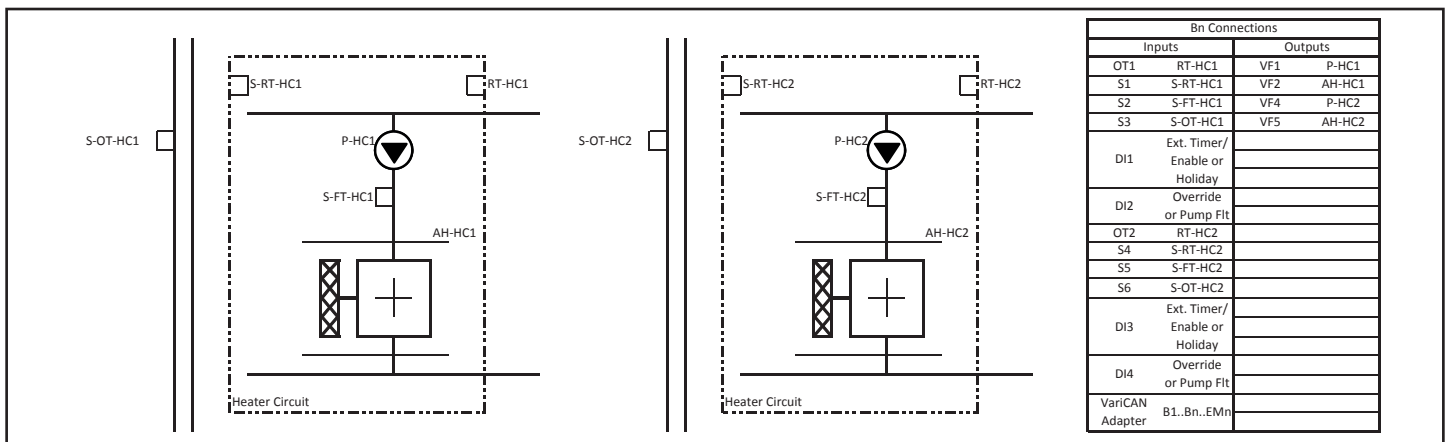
EXTENSION MODULE WITH 2 X AIR HANDLER CIRCUITS
